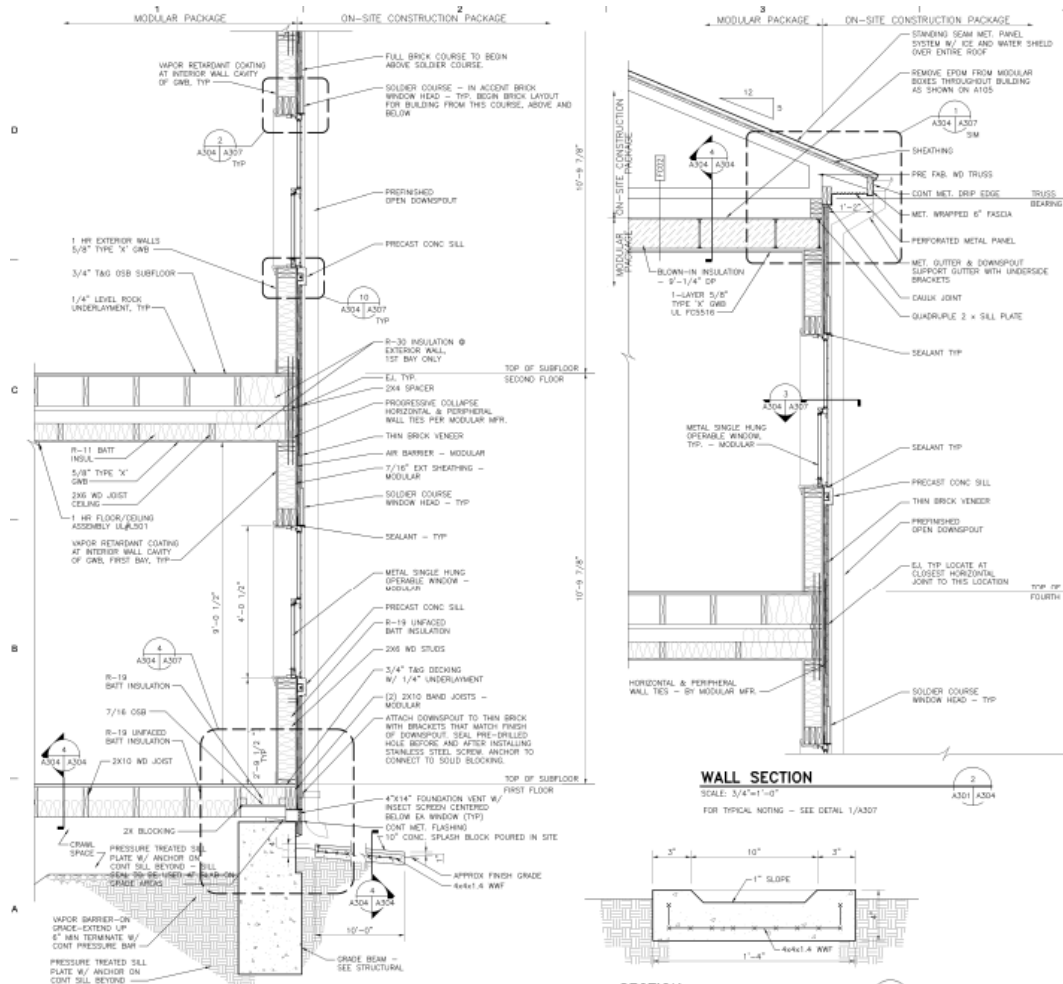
"Dogbone" Barracks vent wall sections, Bldg 2144, Fort Carson, CO.
